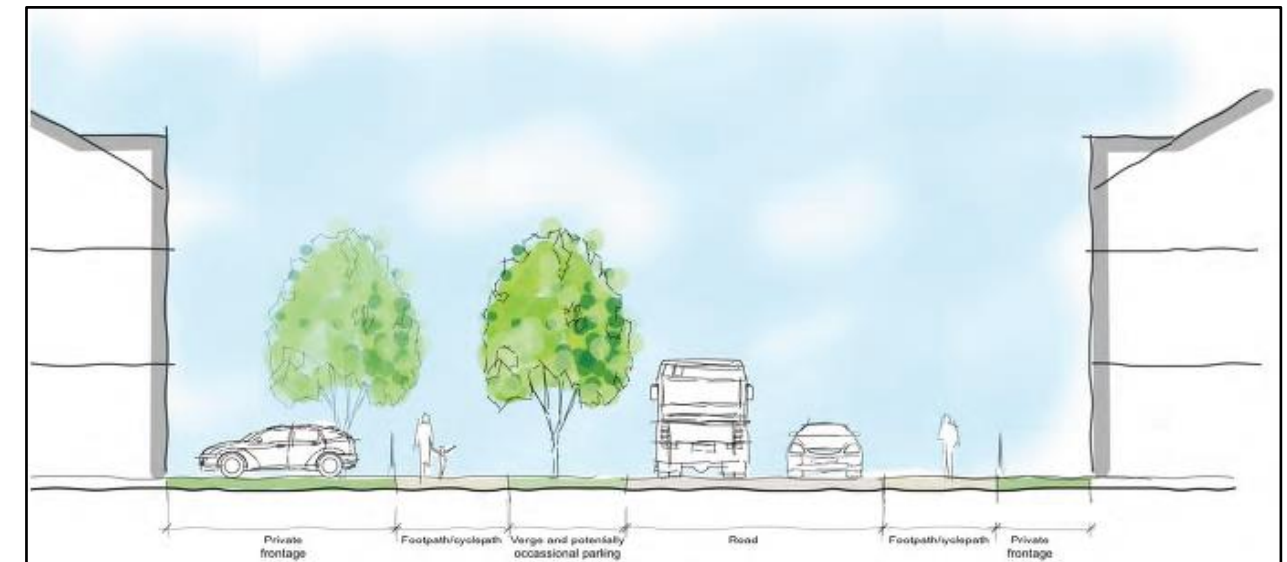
Indicative section of an alternative potential option for the principal street
